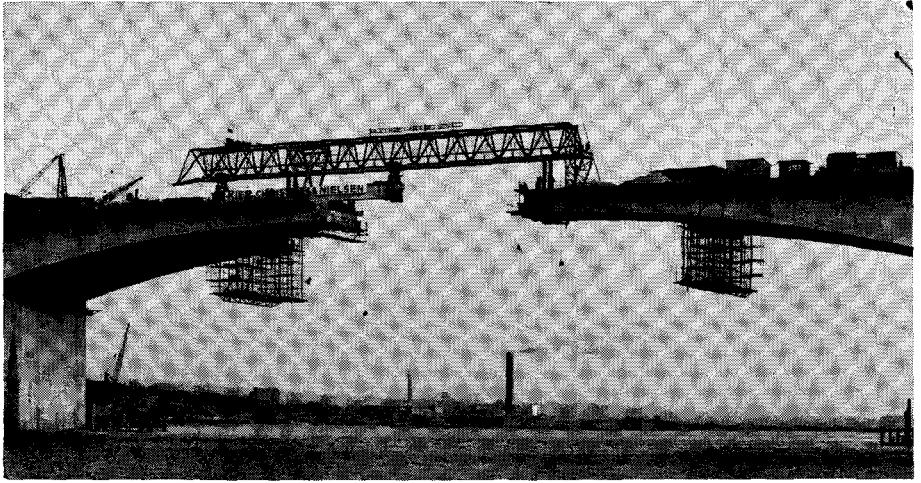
Placing the 100 ft. Drop in Girder to Complete the 500 ft. River Span. Two Sets of Shutters can be Seen Behind the Completed Span, Finishing off the other Half of the Bridge.
